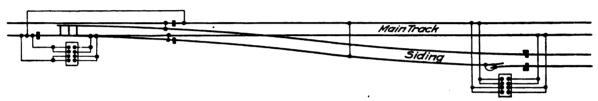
Protection for Switch in Main Track and Derail in Siding.
